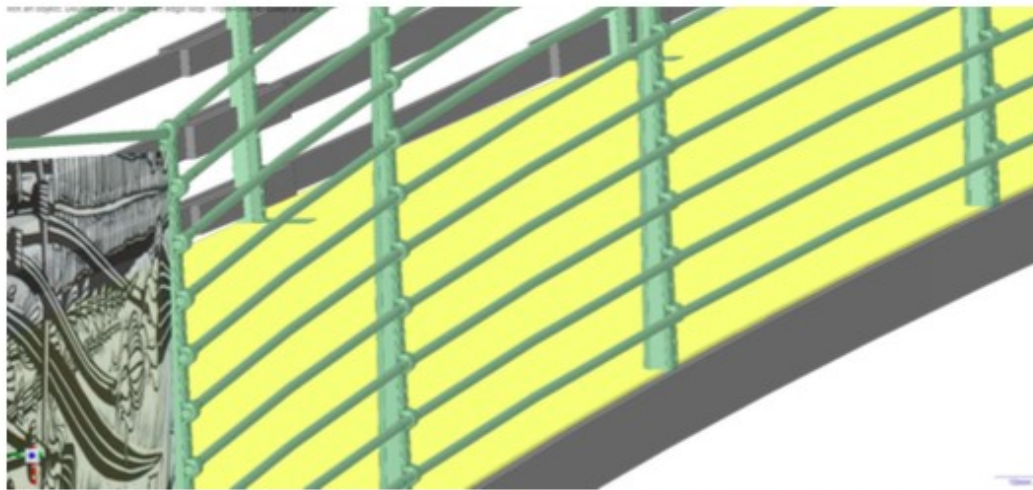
Stanchion detail for the internal handrail. The stanchions here are formed from a single piece of steel, folded back over itself and shaped so as to receive 20mm round bar as the internal balustrading.
